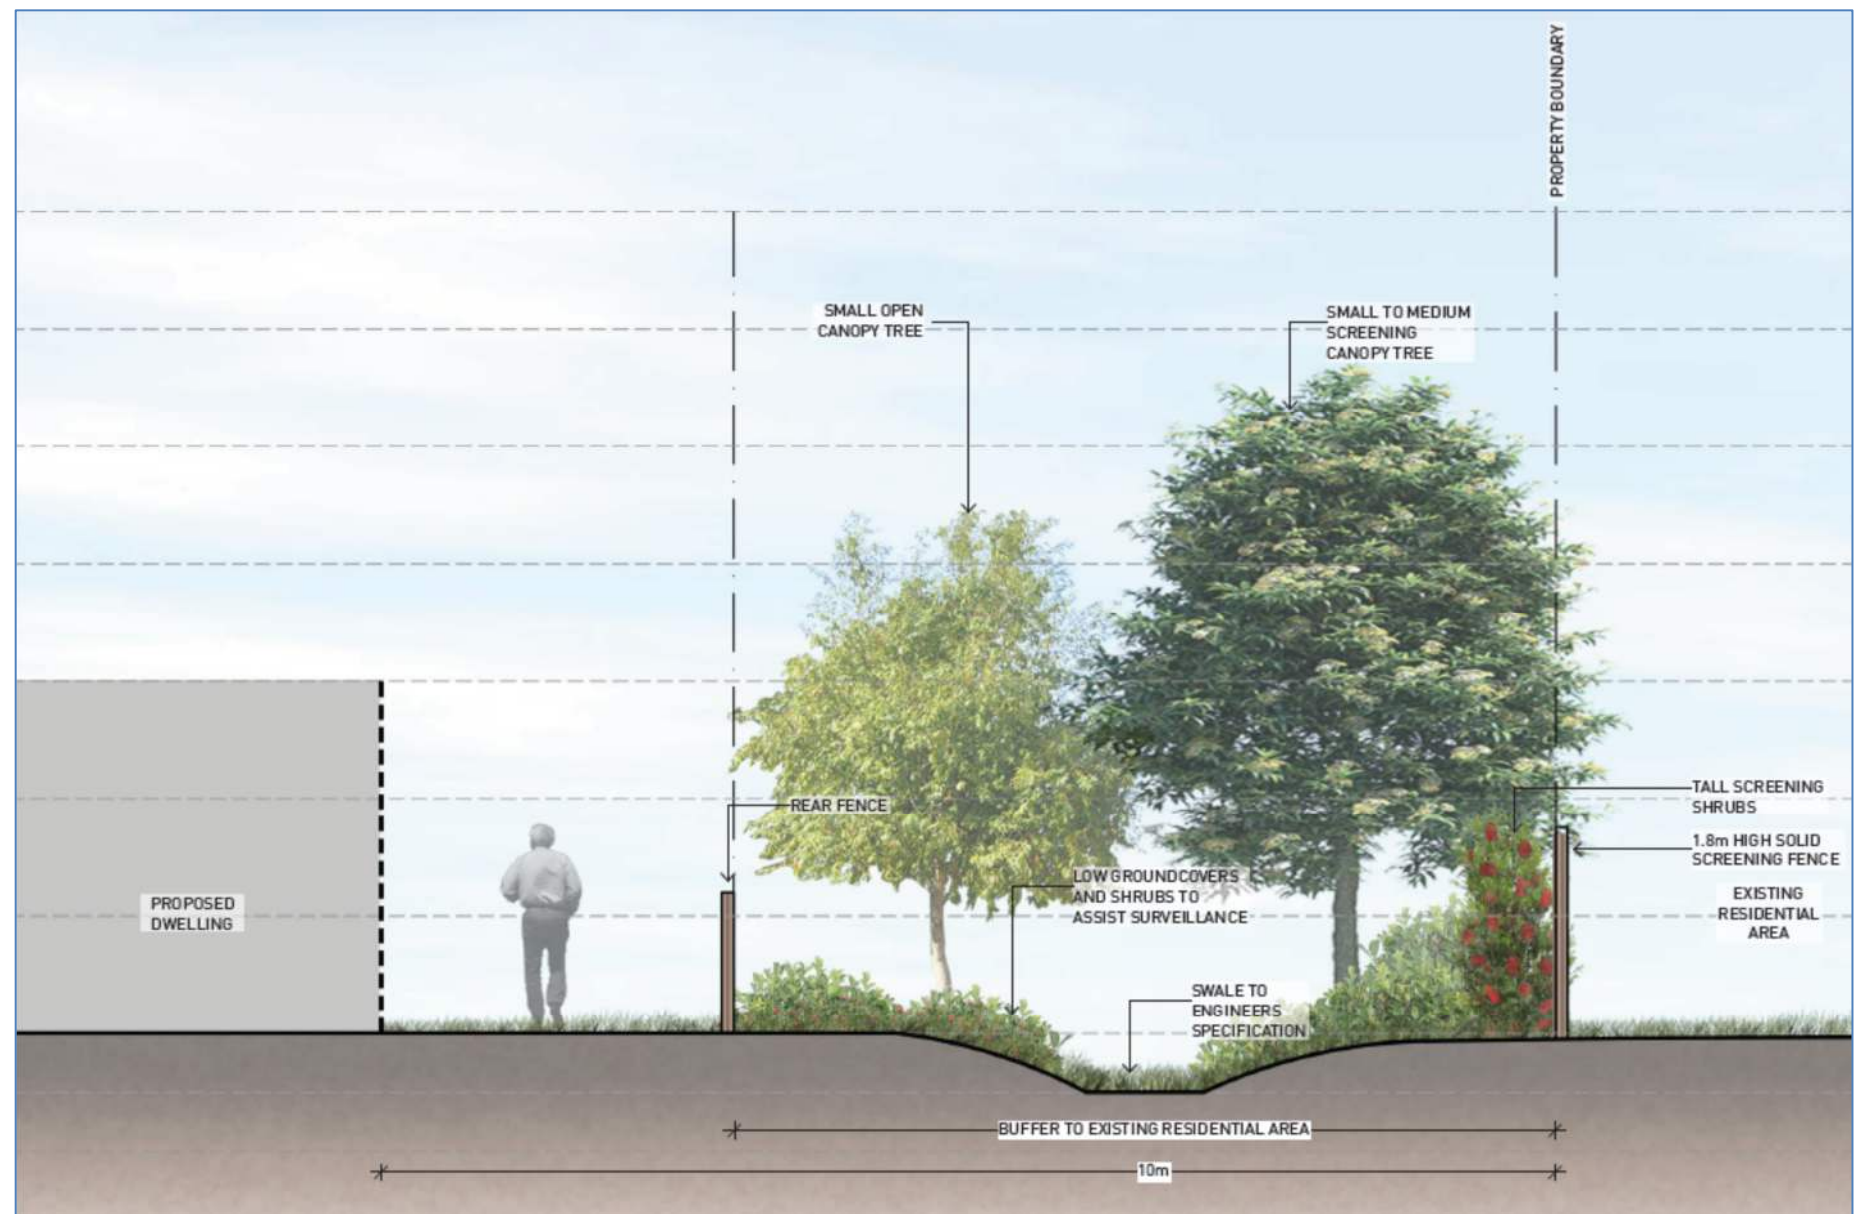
Landscaping cross section of house sites facing the adjoining residential land, showing that a 10m setback will be provided
